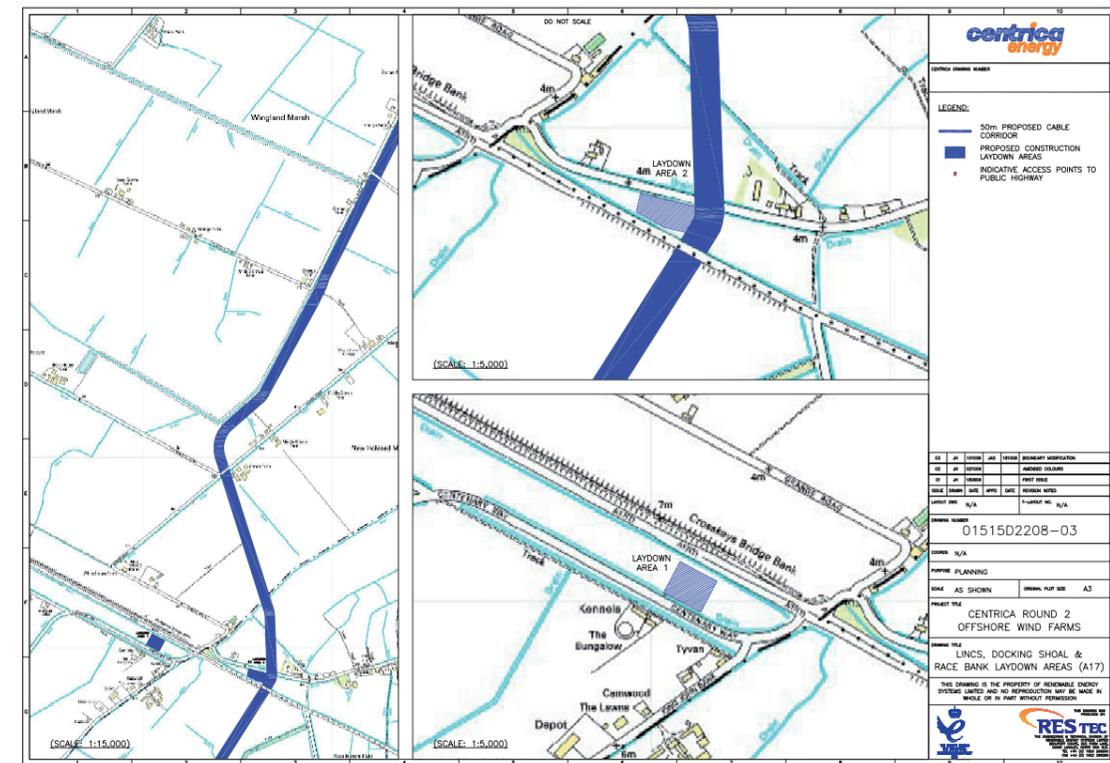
| Details of construction laydown areas adjacent to the A17
